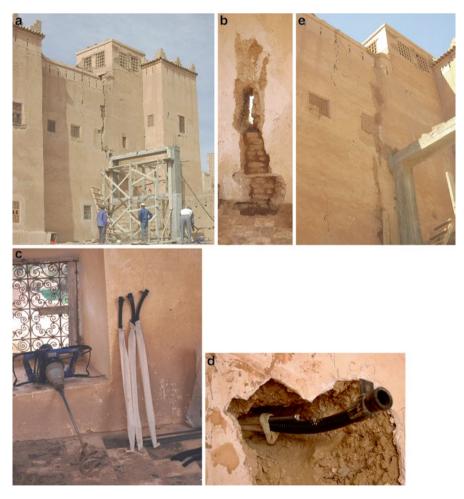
Repair of earth block walls, crack repair: pinning [76]. (a) Reinforced steel frame installed as emergency shoring before crack repair, (b) filling of cleaned crack with earth blocks, (c) steel pins and plastic hose inserted in gauze tube, (d) steel pin inserted into drill hole, and (e) view of wall after the crack repair
